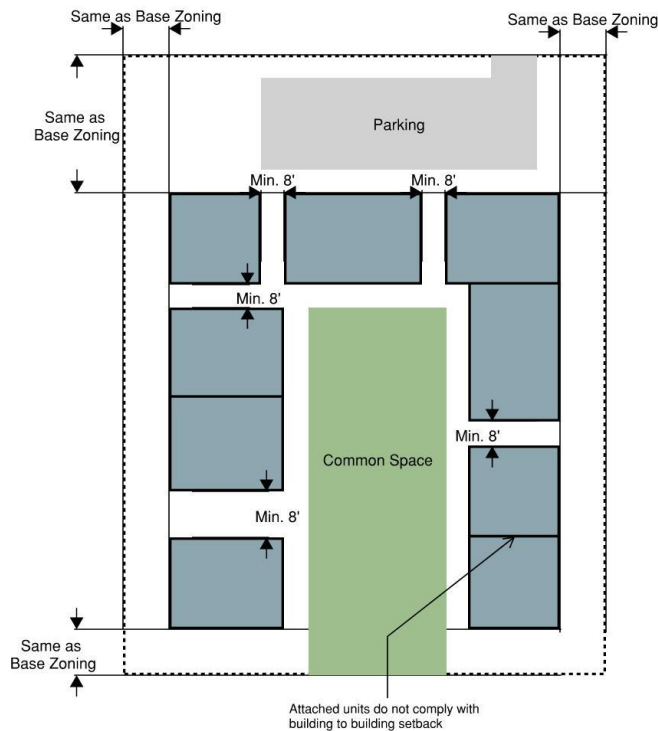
(A)(1): Cottage Setbacks and Building to Building Placement
